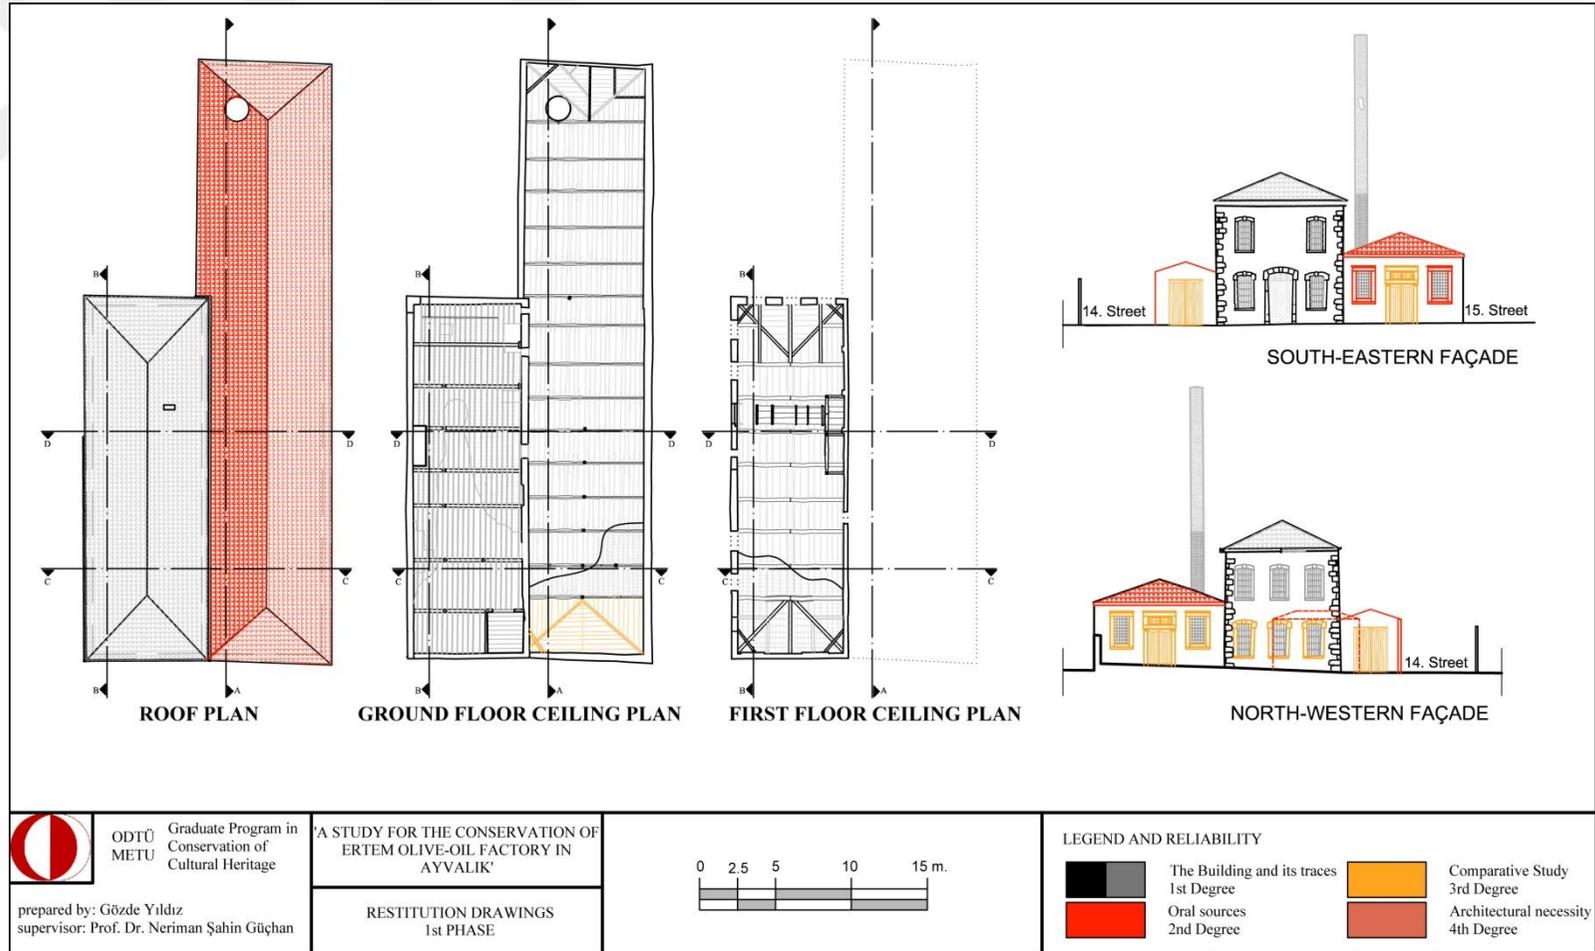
1st Phase of the Factory, roof plan, ceiling plan and façades
